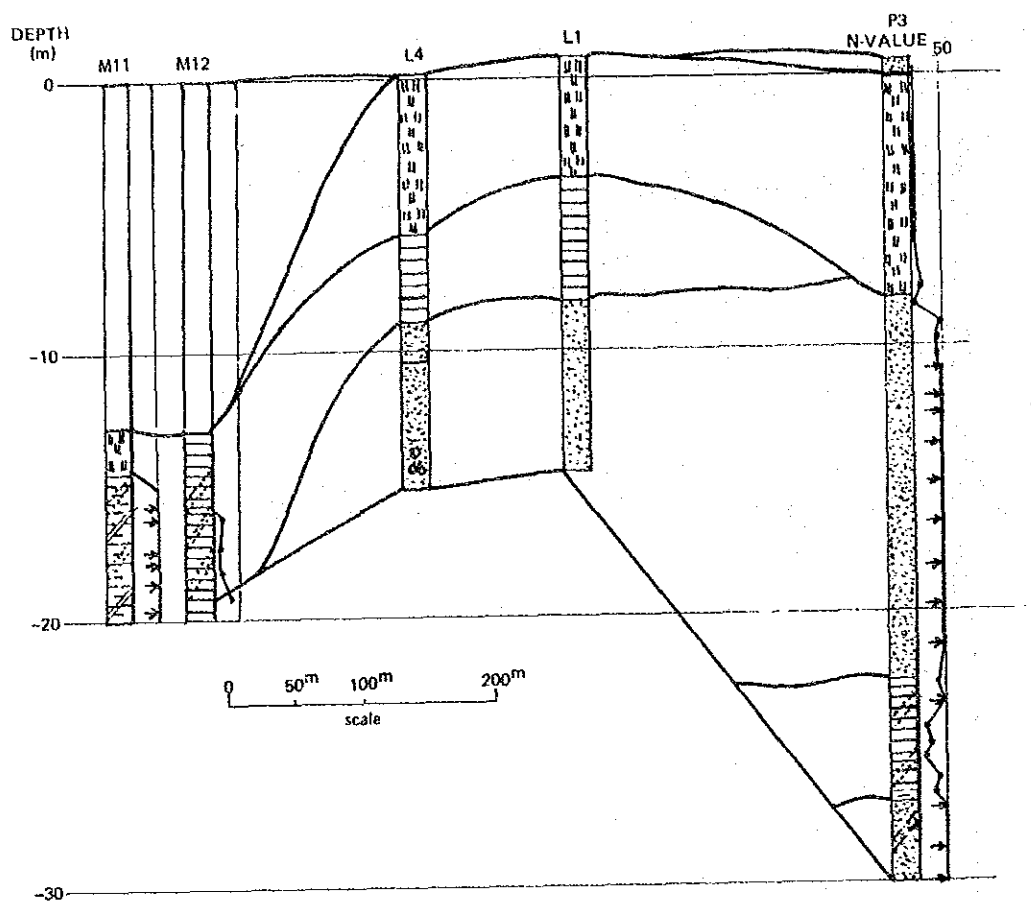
Soil Profile, Section ⑤ - ⑤
